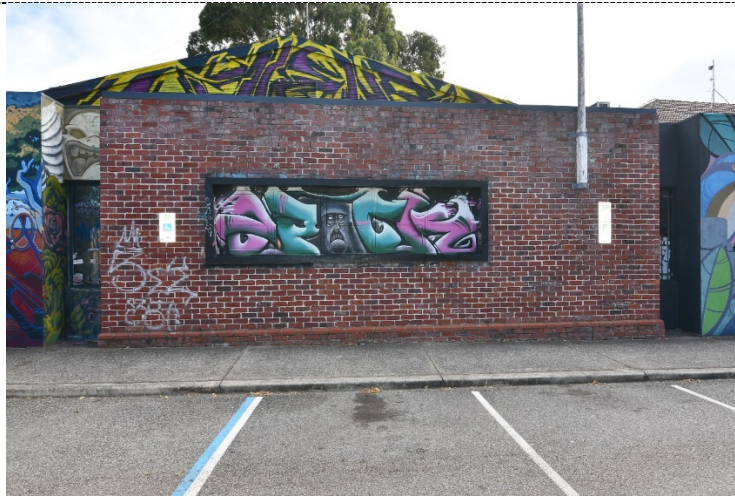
View of the south elevation of the Administration Building and Gig Space. The plain brick wall with original windows (later covered) is the only remaining part of the former Yard Office.
